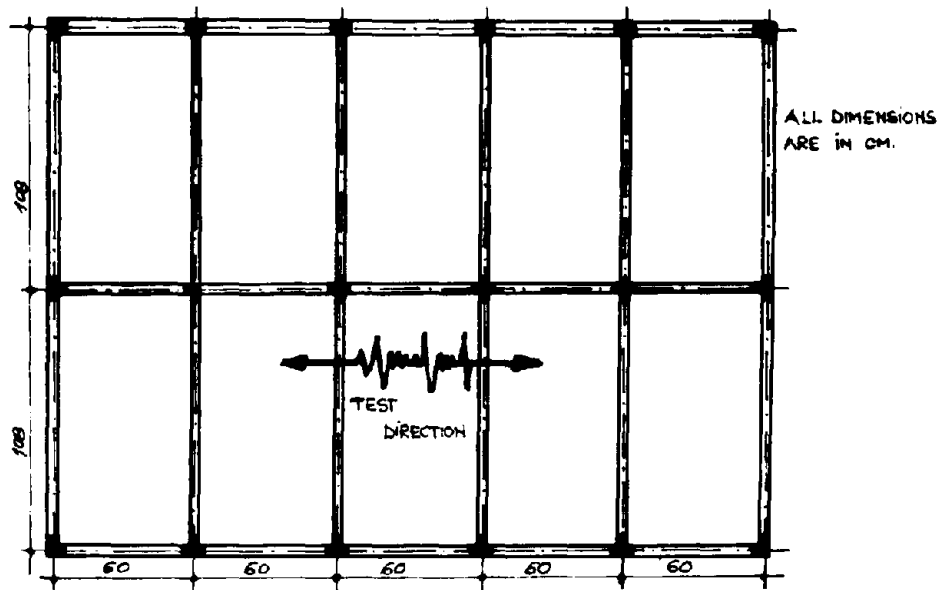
FLOOR PLAN OF A FIVE STORY STRUCTURAL MODEL WITH NONBEARING FACADE WALLS.
